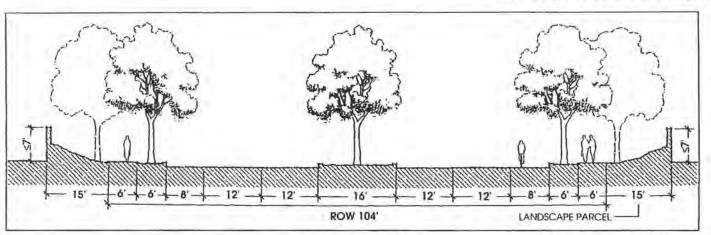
Typical section, Laurel Road west of Route 4 Bypass.
